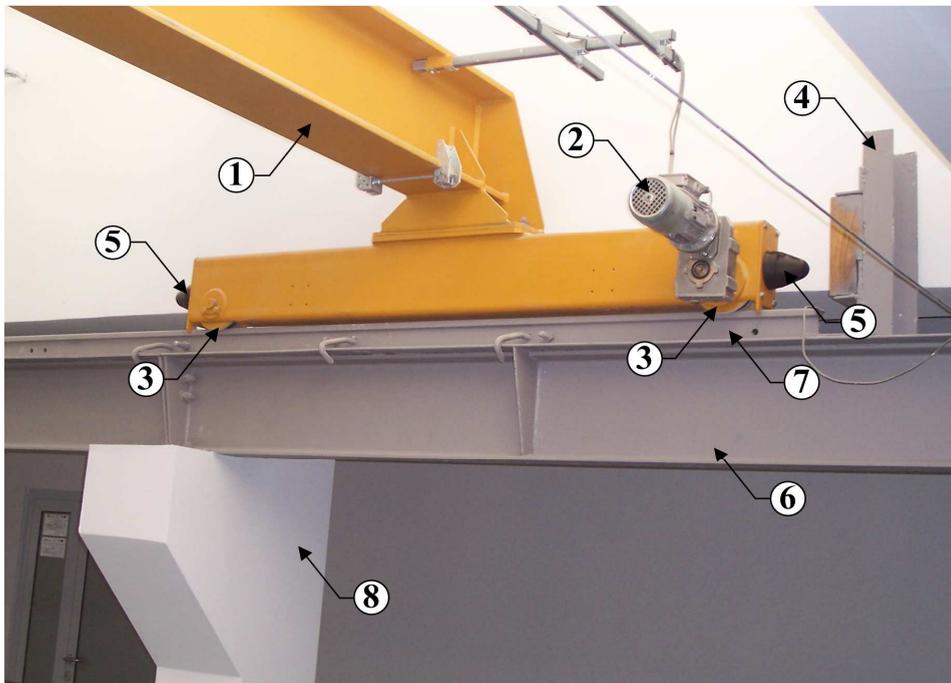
Detail of the crane bridge support on the steel runway beams; 1 – crane bridge, 2 – motor, 3 – crane wheels, 4 – buffer, 5 – bumper, 6 – runway beam, 7 – crane rail, 8 – column with a short cantilever (photo by author)
